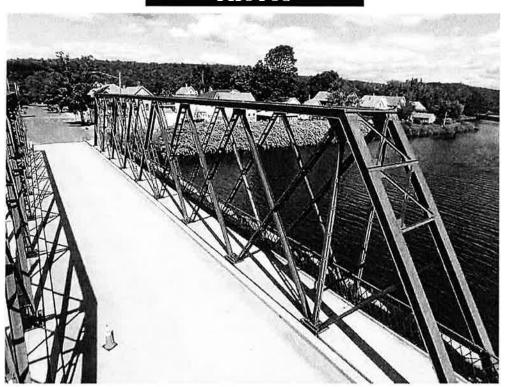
North truss tower – web members have scattered locations of peeling paint and light rust.
